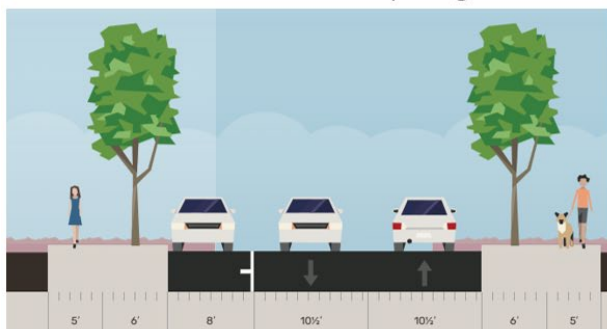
Cross Sections of Public Road A at Subdivision Entrance
